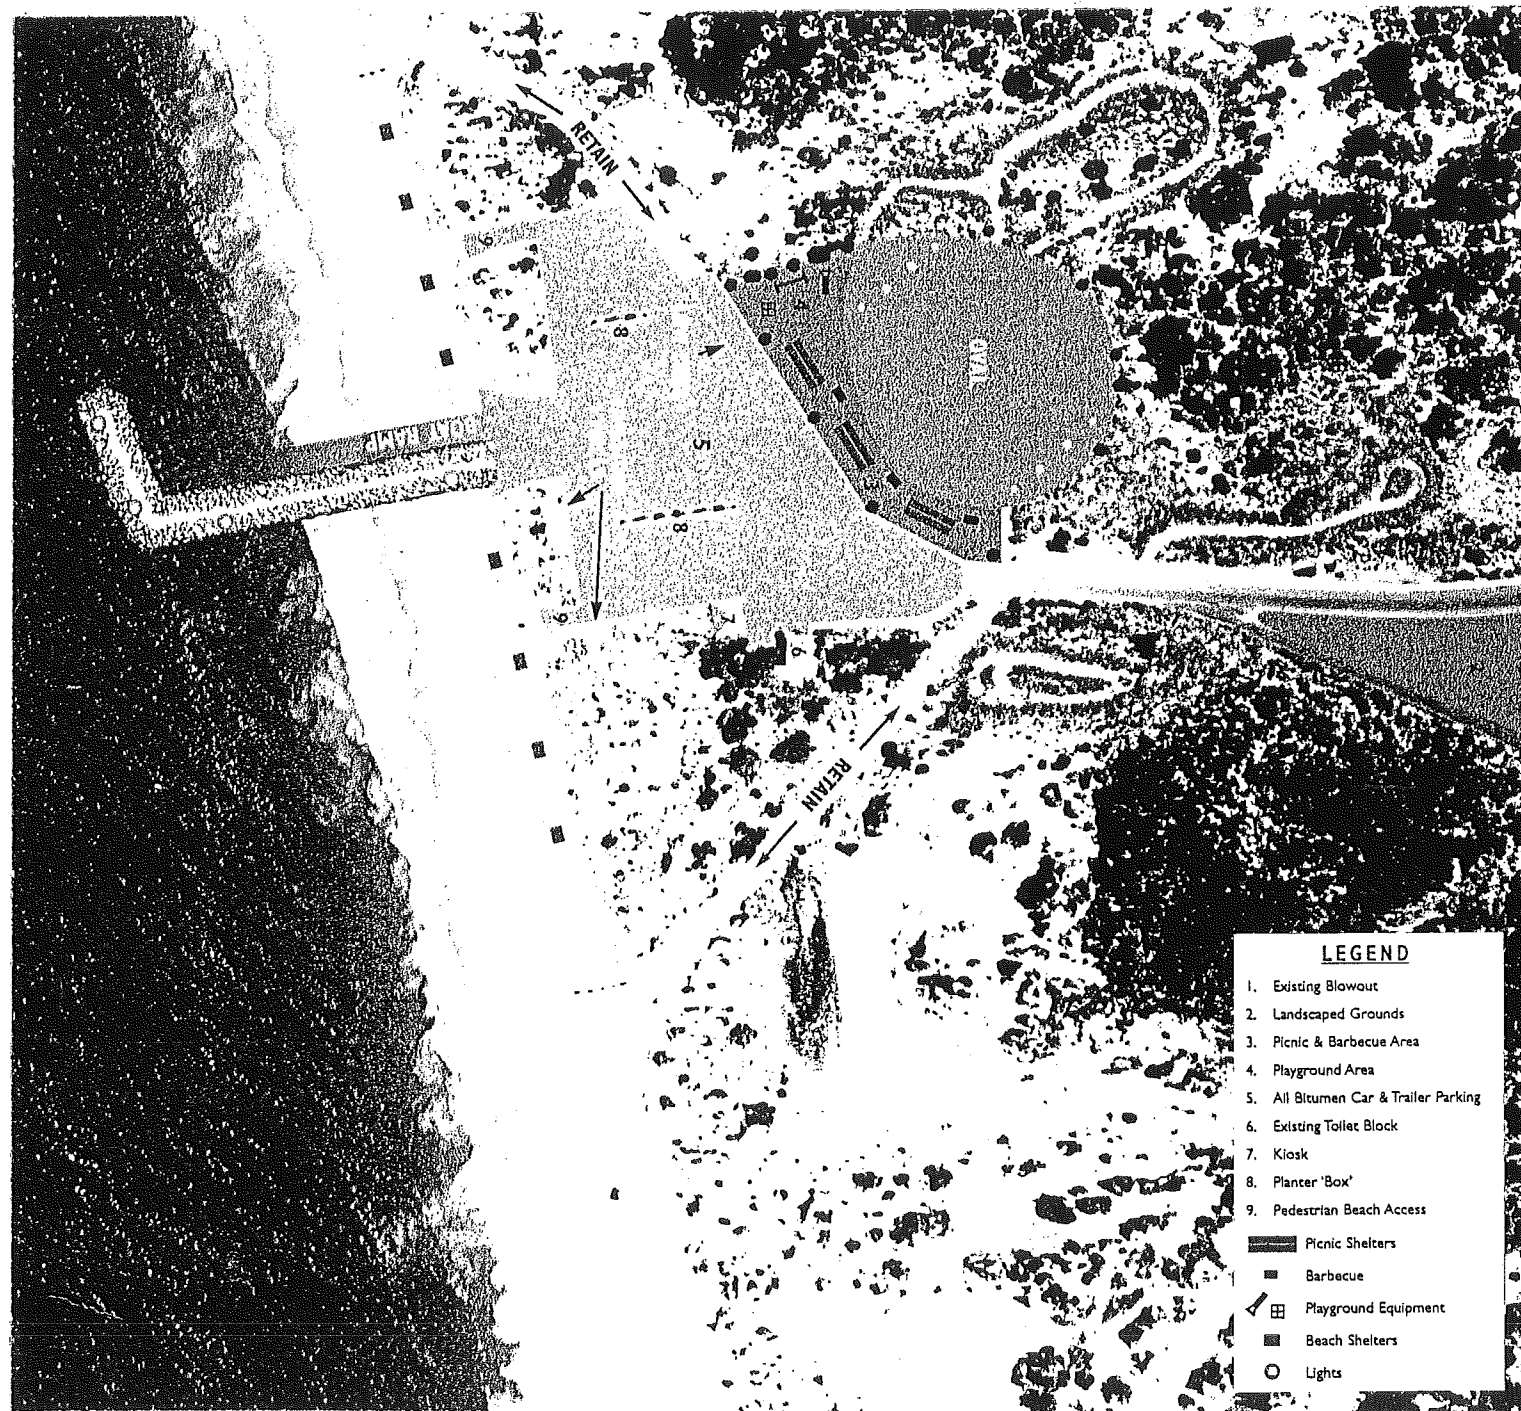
Proposed Groyne, Boat Ramp and Public Recreation Plan.
